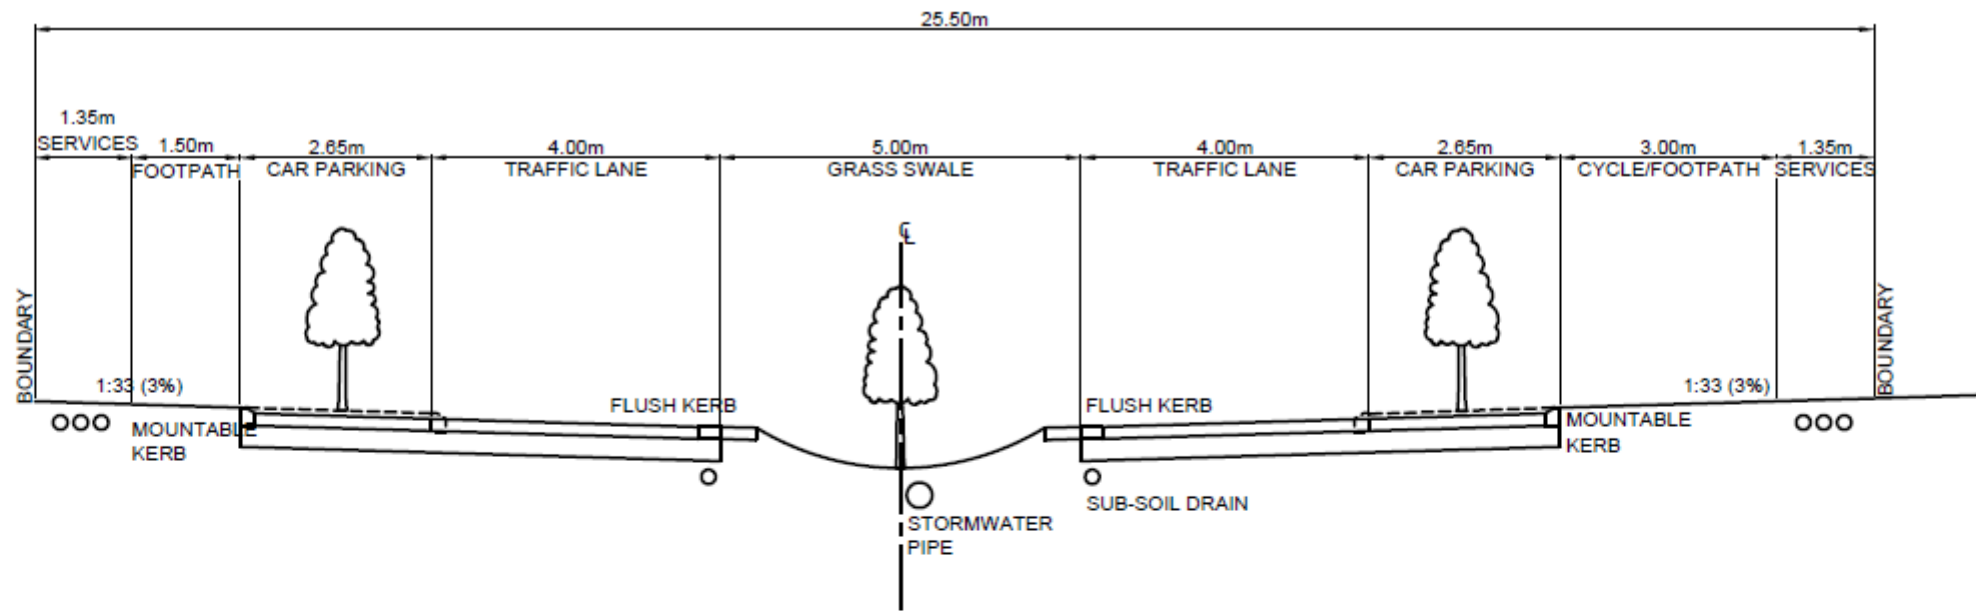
Te Kauwhata Structure Plan – Road cross sections – Collector Roads
